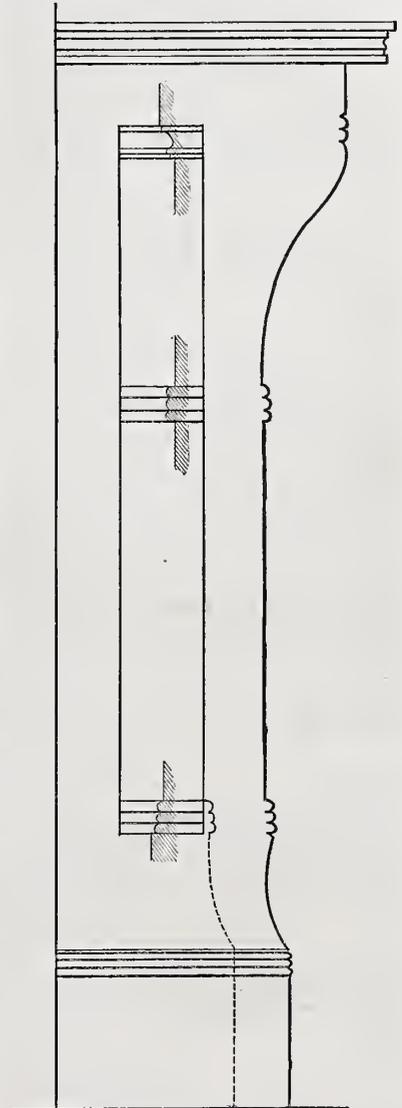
Detail of Mantel Supports, Design A.—Scale, 1 1/2 Inches to the Foot.
